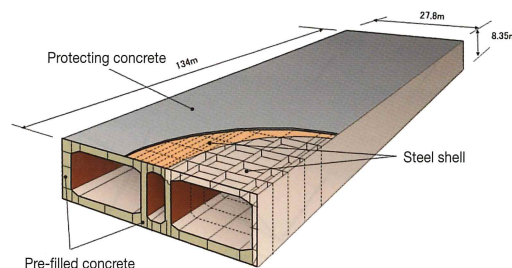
Steel-concrete composite structure of Full-sandwich type
